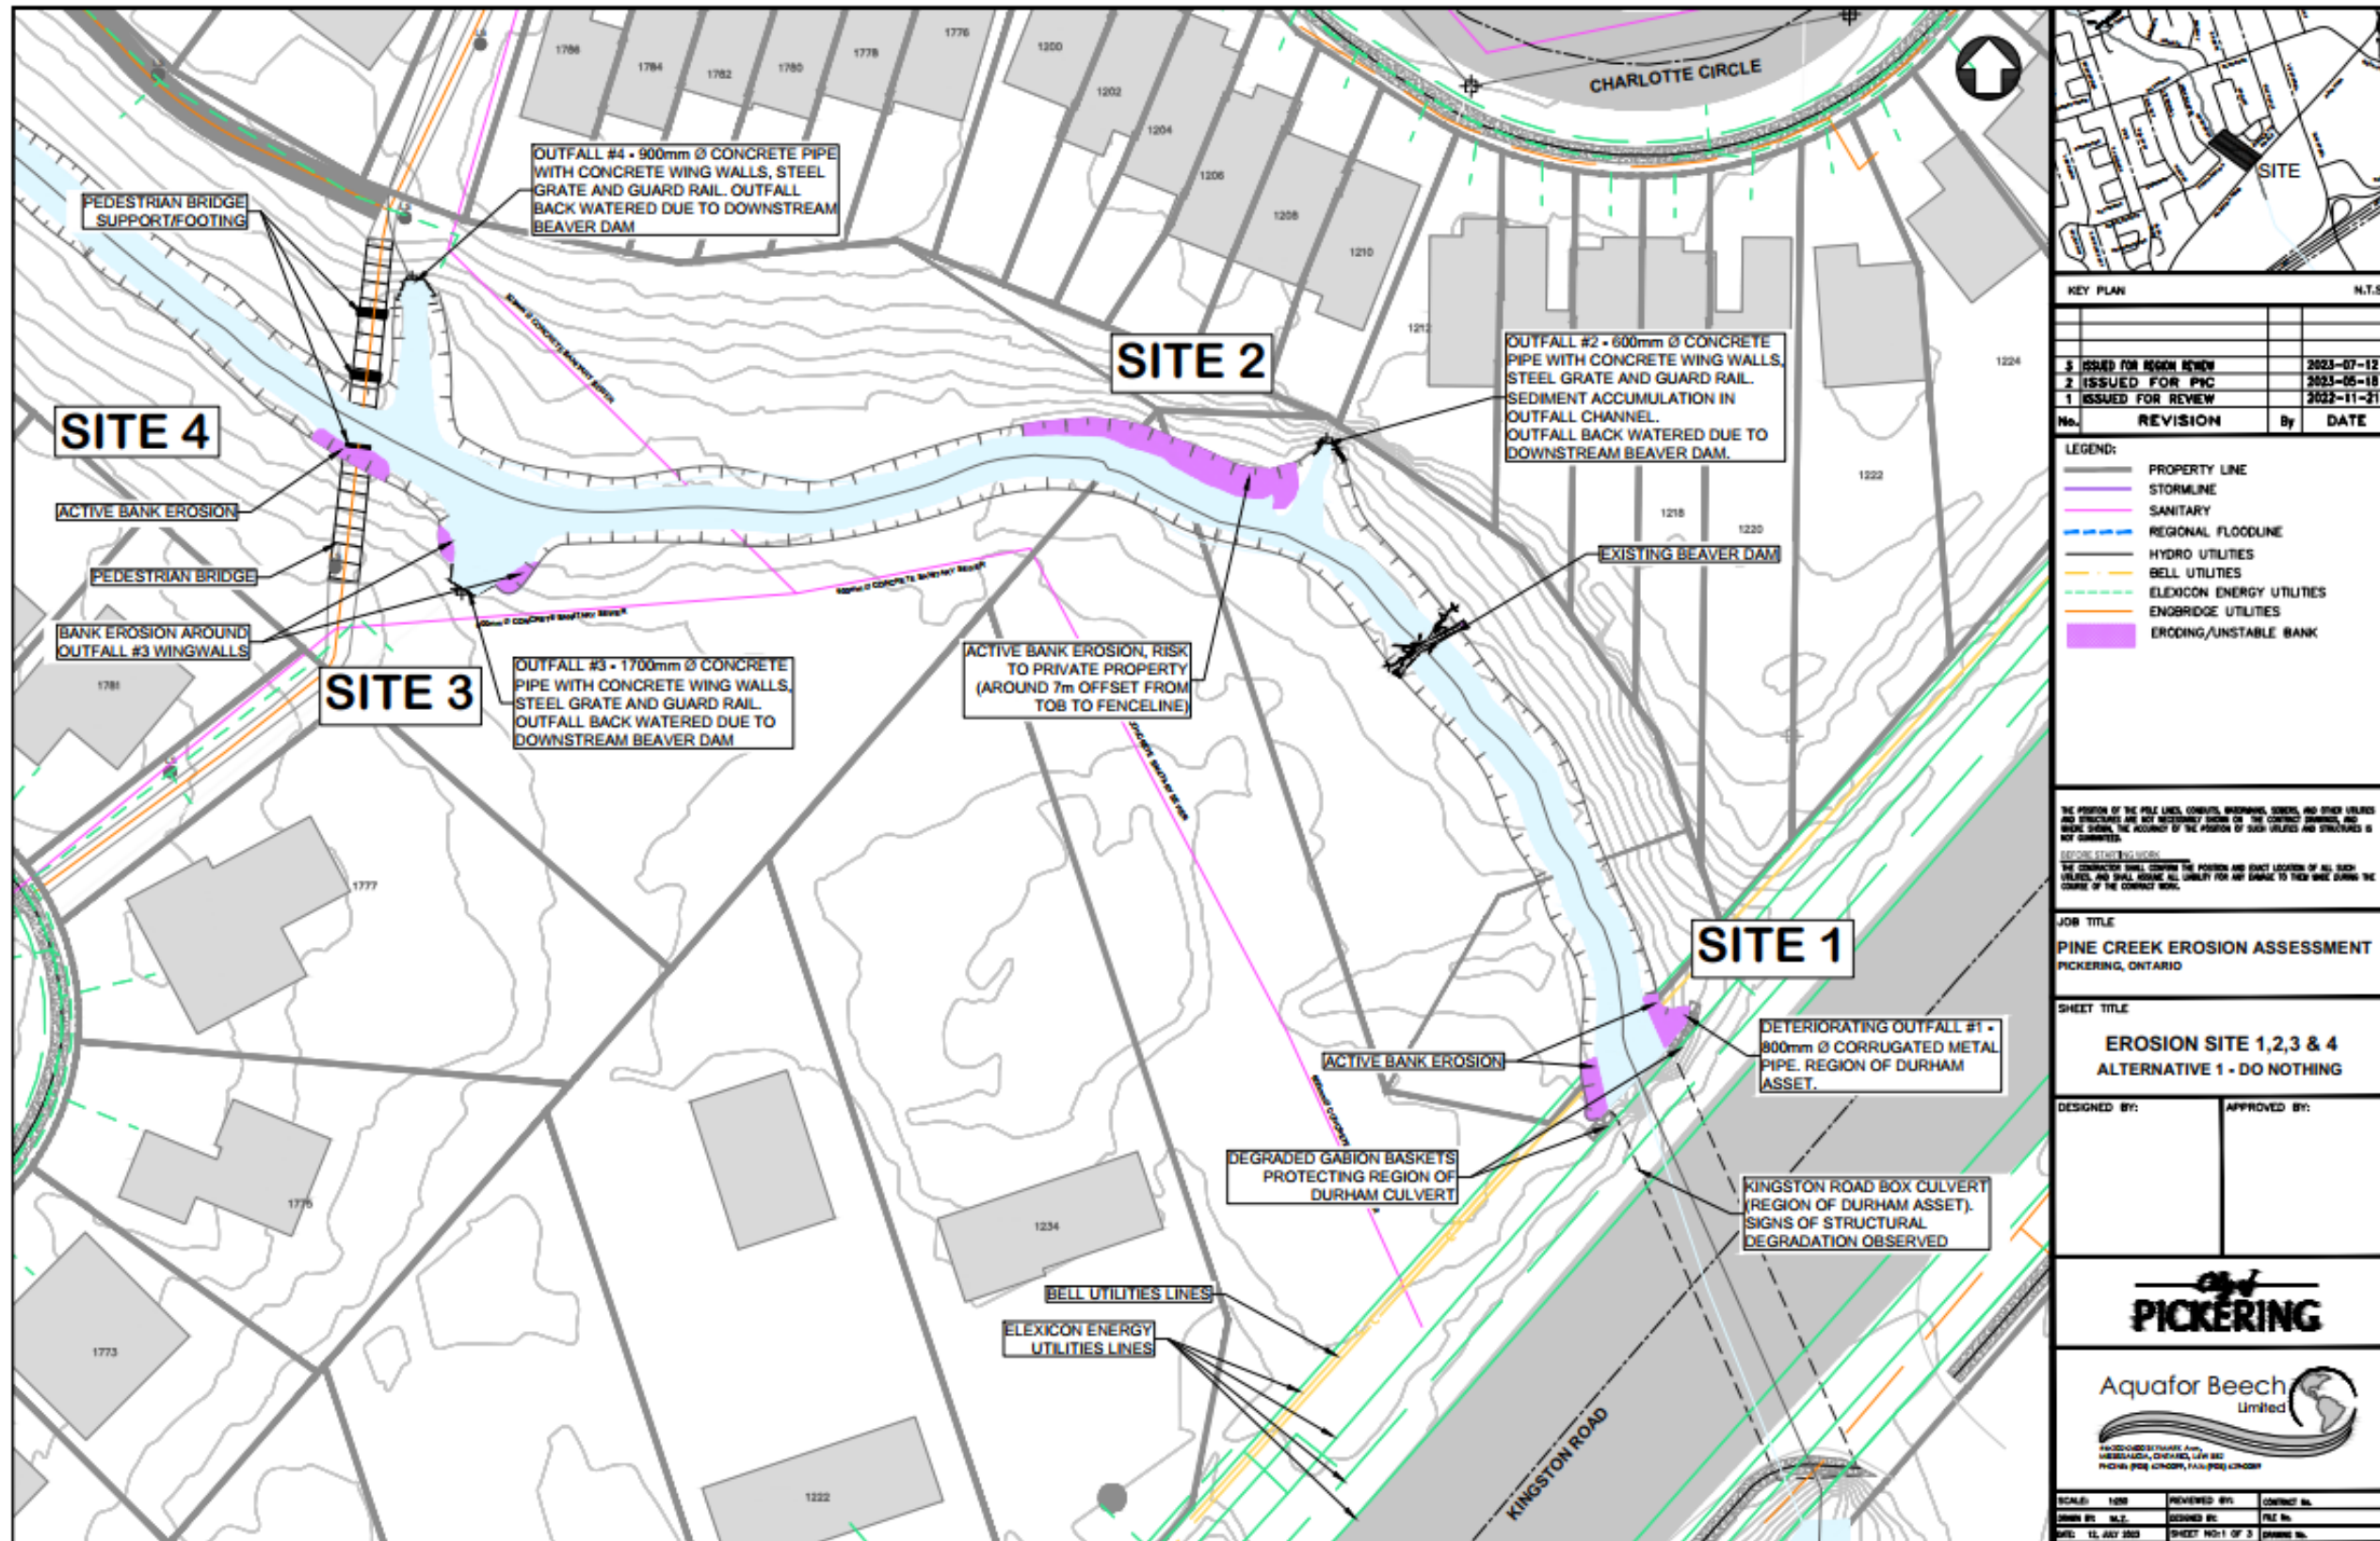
Erosion Site #1-4: Existing Site Conditions
